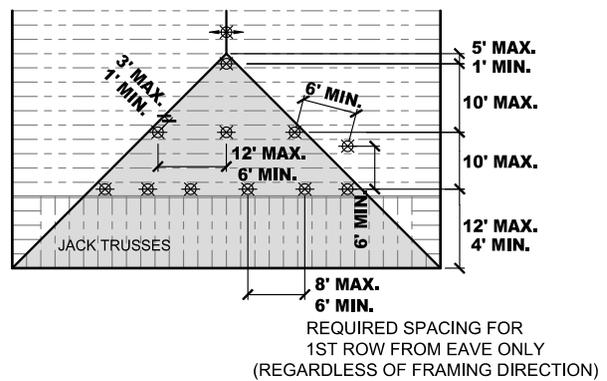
B: HIP LAYOUT CRITERIA WHEN FIRST ROW OF SPRINKLERS PLACED "BEYOND" JACK TRUSSES
